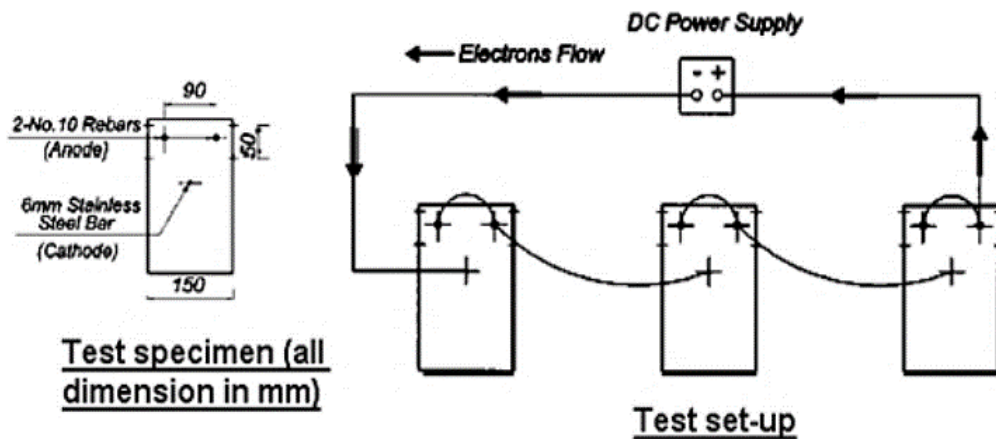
Set-up for accelerated reinforcement corrosion in large-sized reinforced concrete beam specimen. (Azad, et al. 2007)
